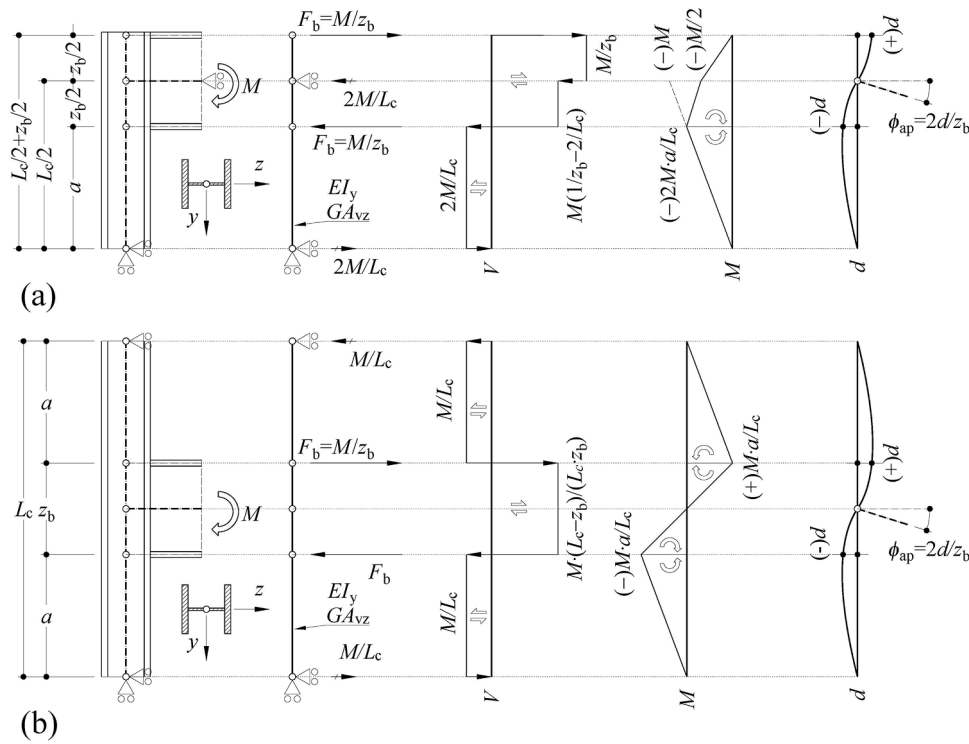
Internal forces on equivalent beam models: (a) Roof joint; (b) Internal joint.
